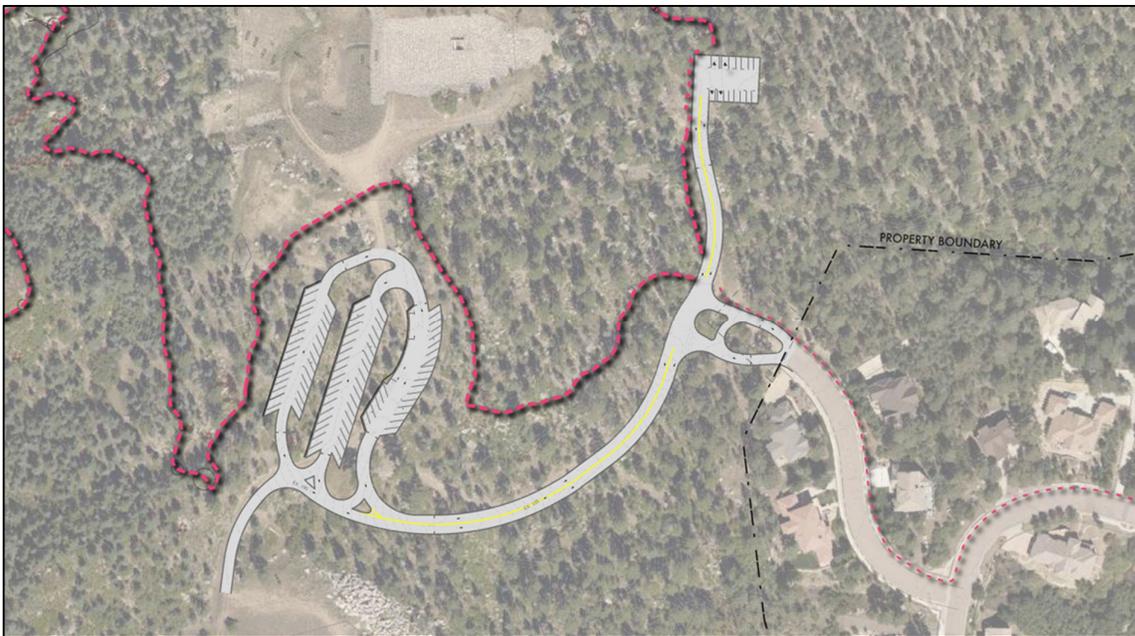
Alternative 2 (November 2024) Conceptual Parking Layout
